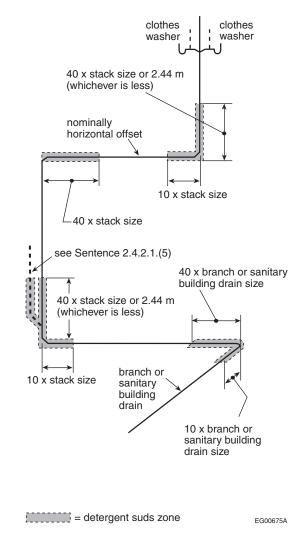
(2) Soil-or-Waste Pipe Connections
